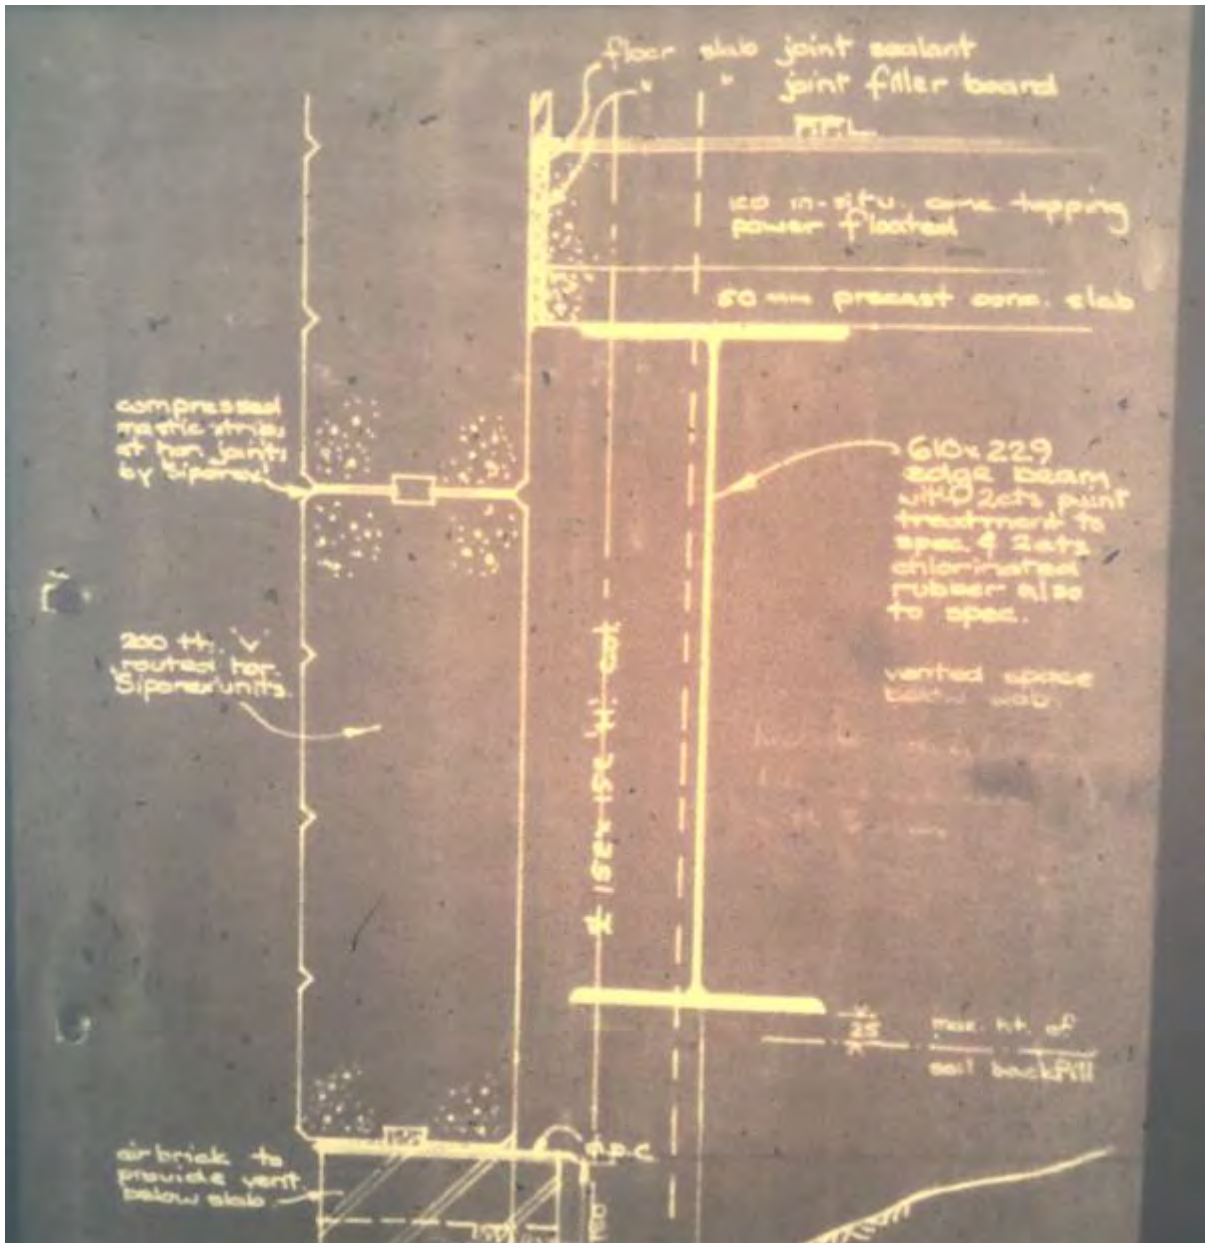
Indicating 152x152 H Column, 610x229UB edge beam & 200mm Siporex wall units
